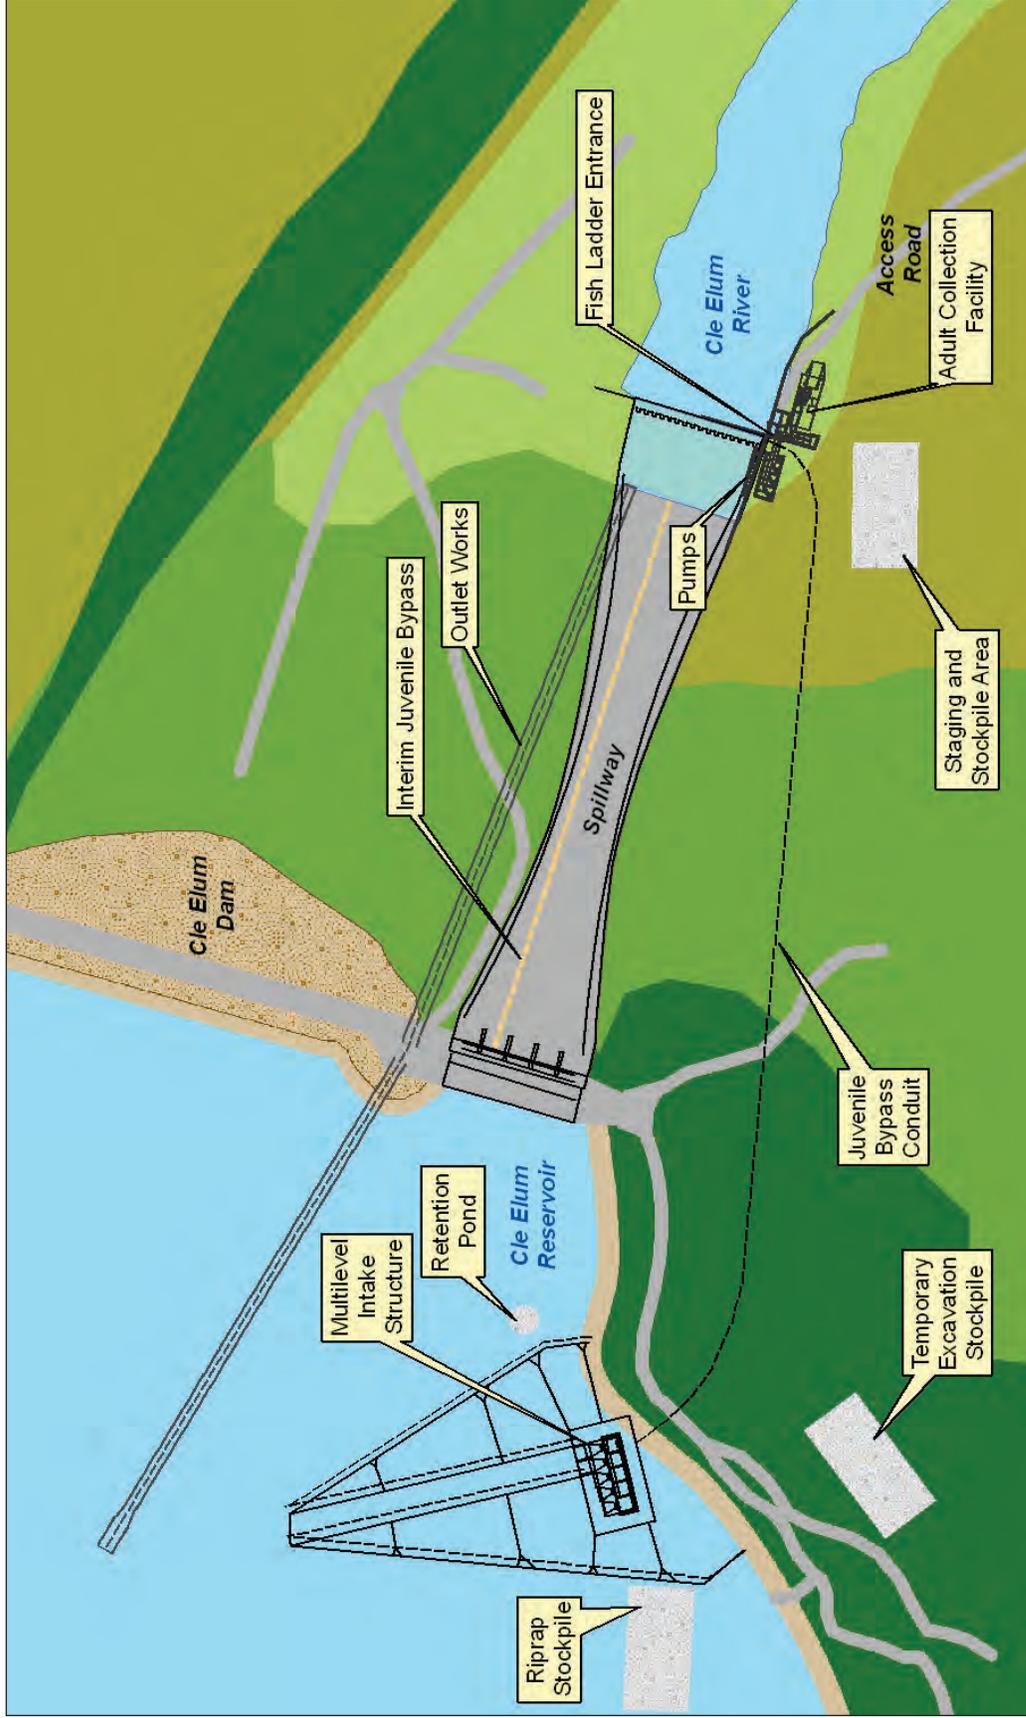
Proposed Cle Elum Dam Fish Passage Facilities
